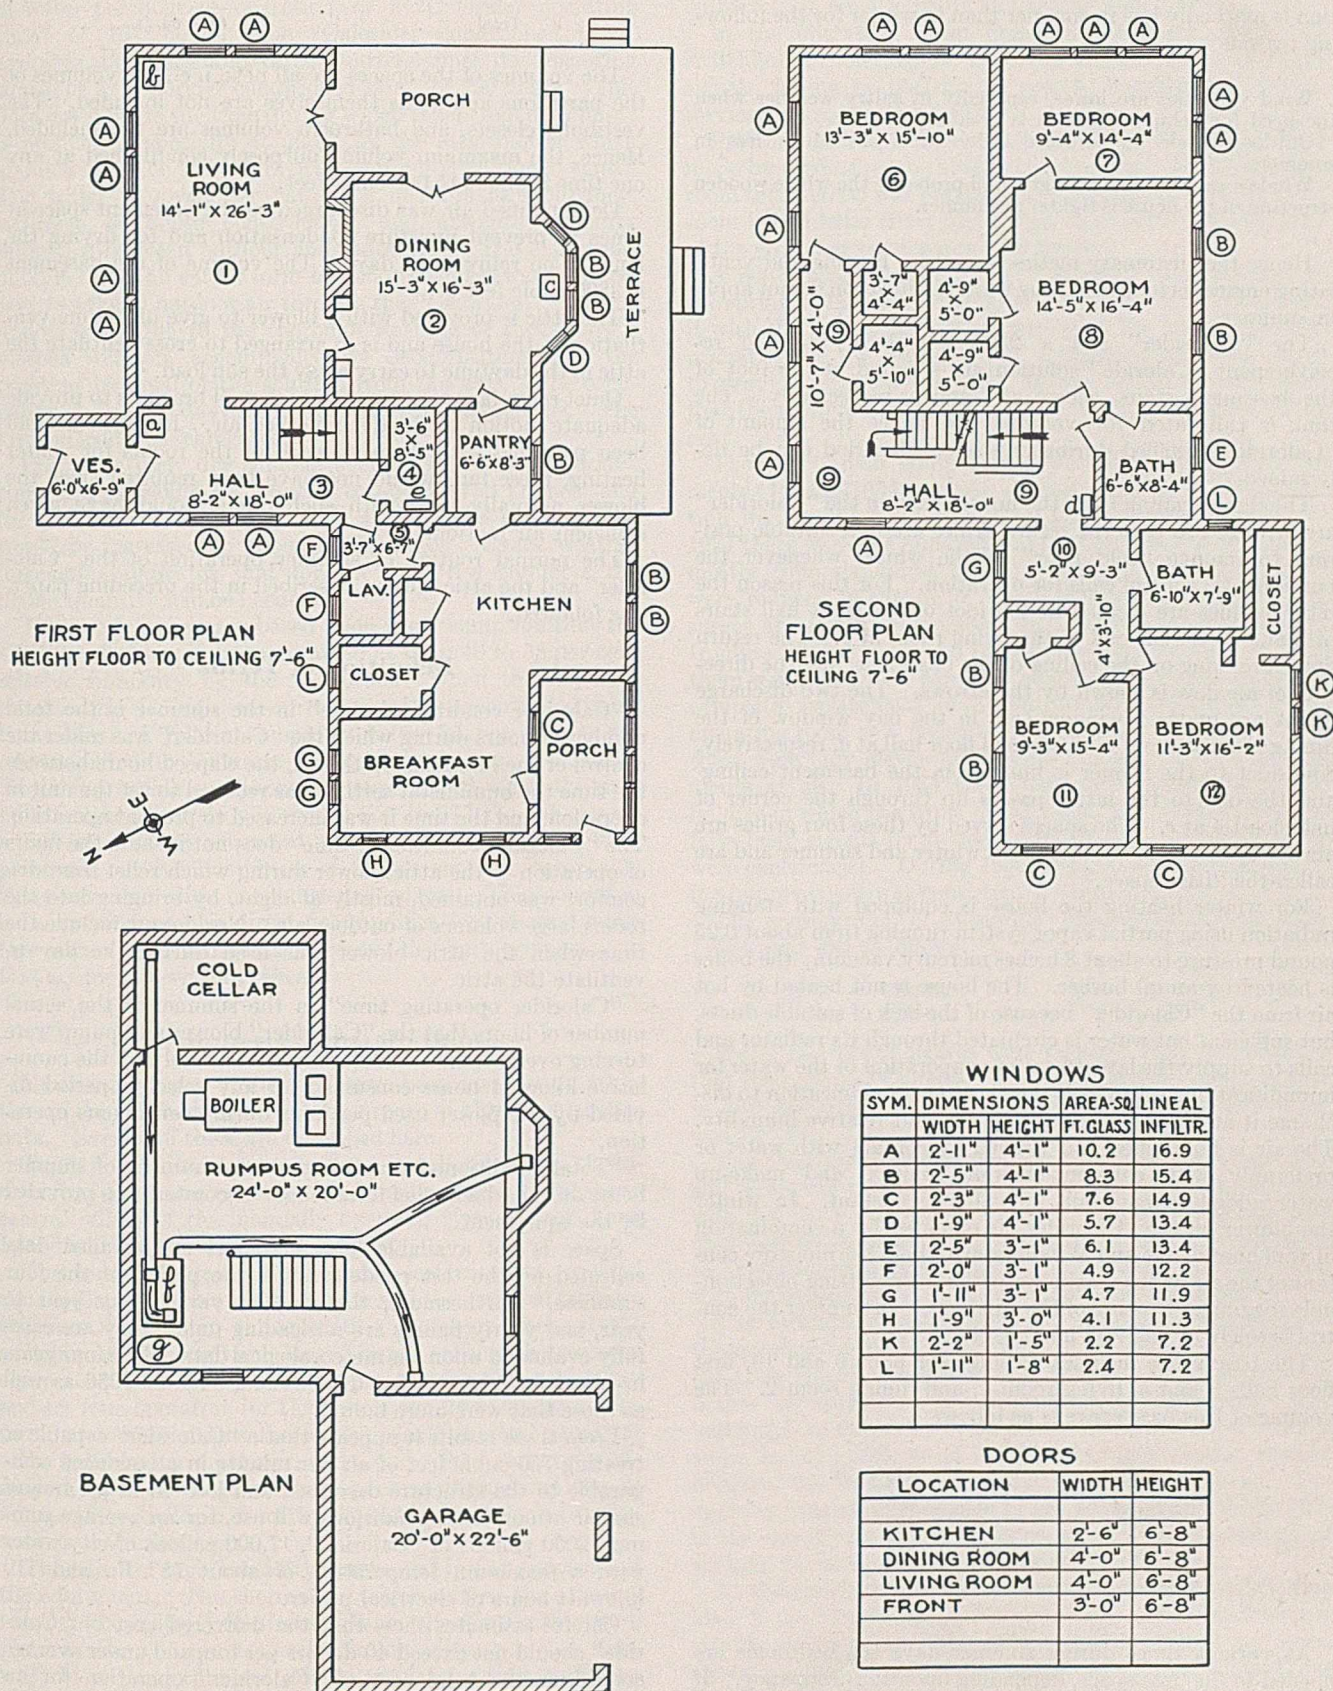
FLOOR PLANS OF AIR-CONDITIONED HOUSE
